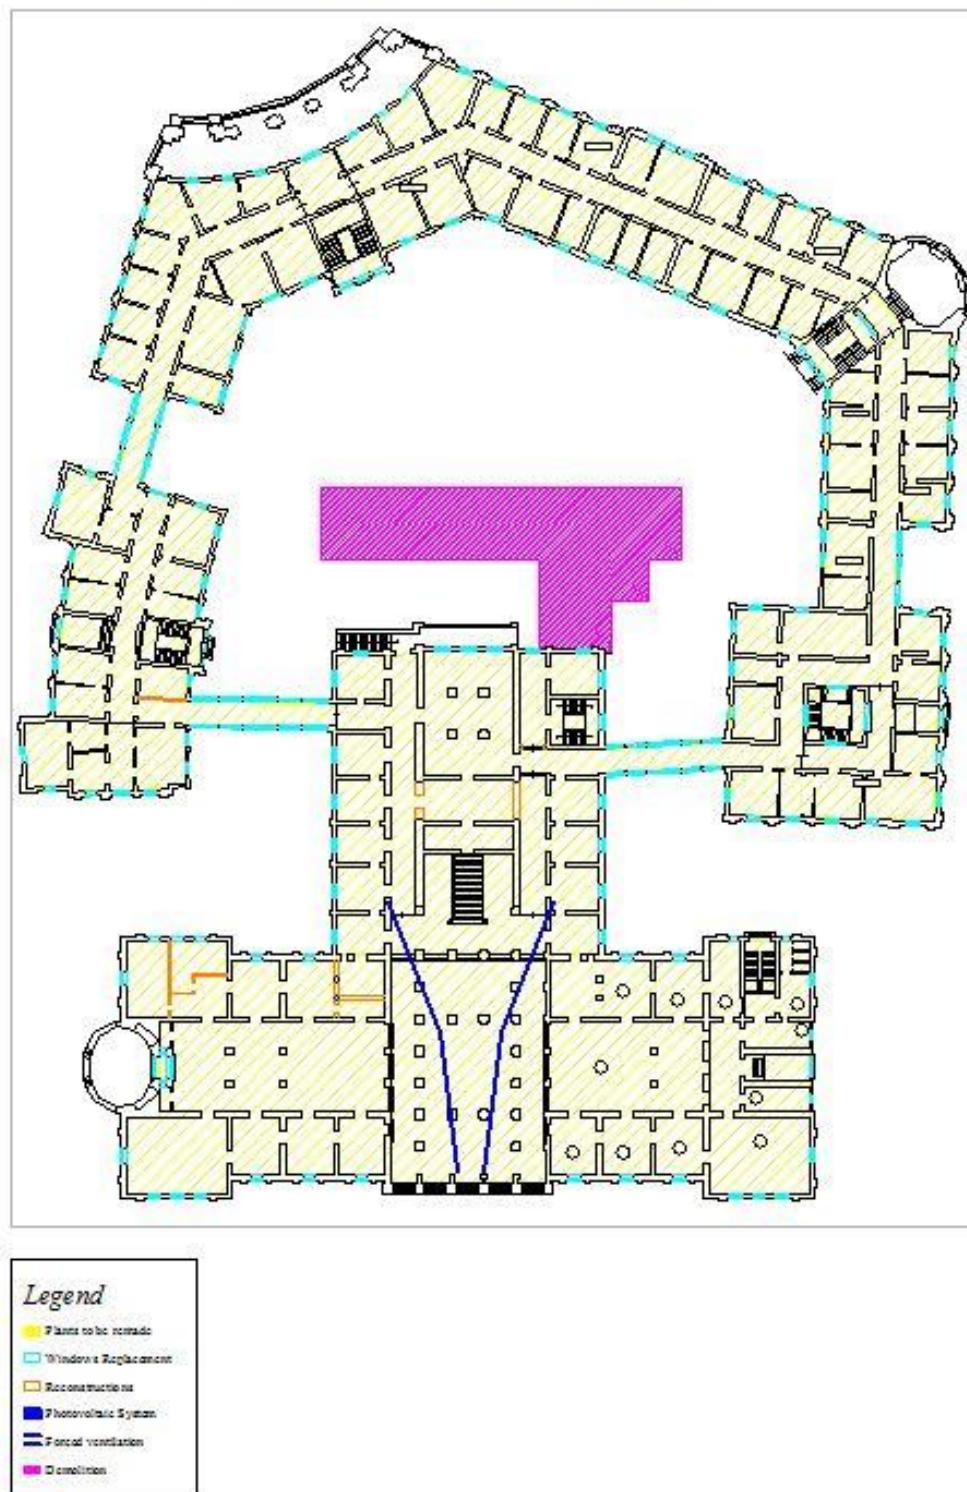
GROUND FLOOR BUILDING DESIGN
